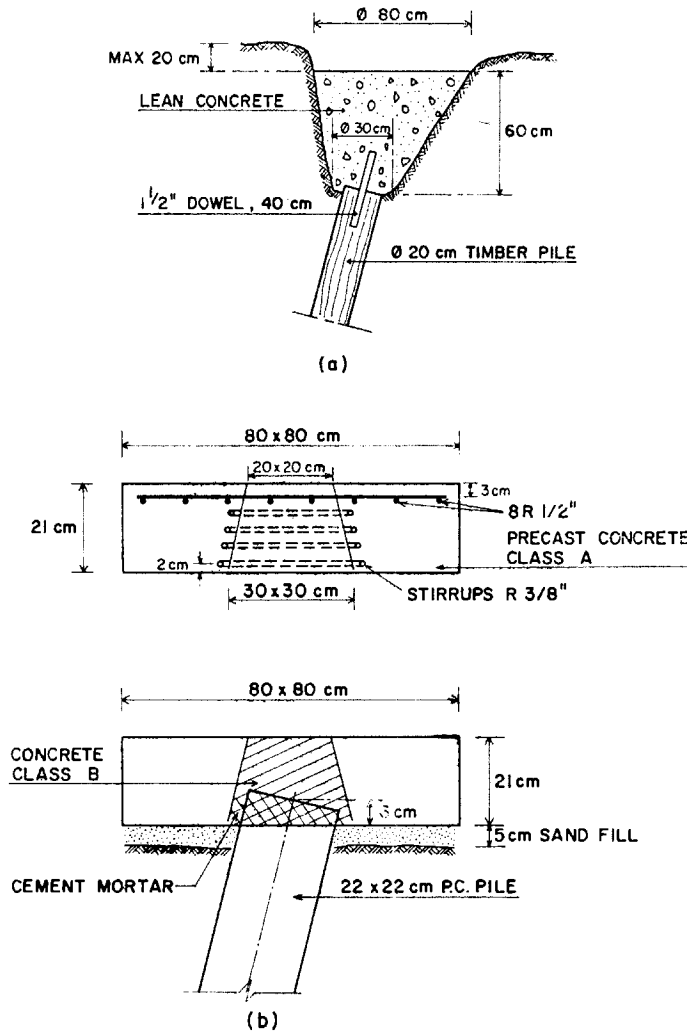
Pile cappings; (a) timber piles, (b) concrete piles.
